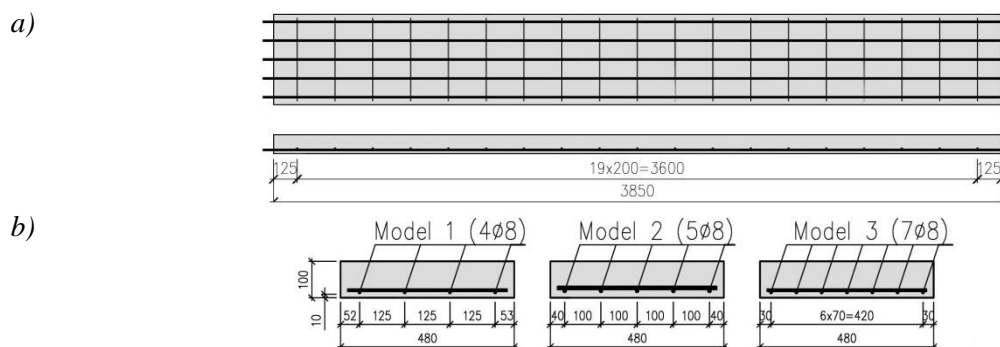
Model of testing - arrangement of the reinforcement (Wieczorek M., 2013):
